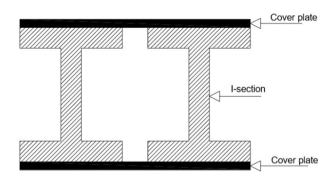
Cross-section of column (for 8, 16 and 24 storey diagrid building)
